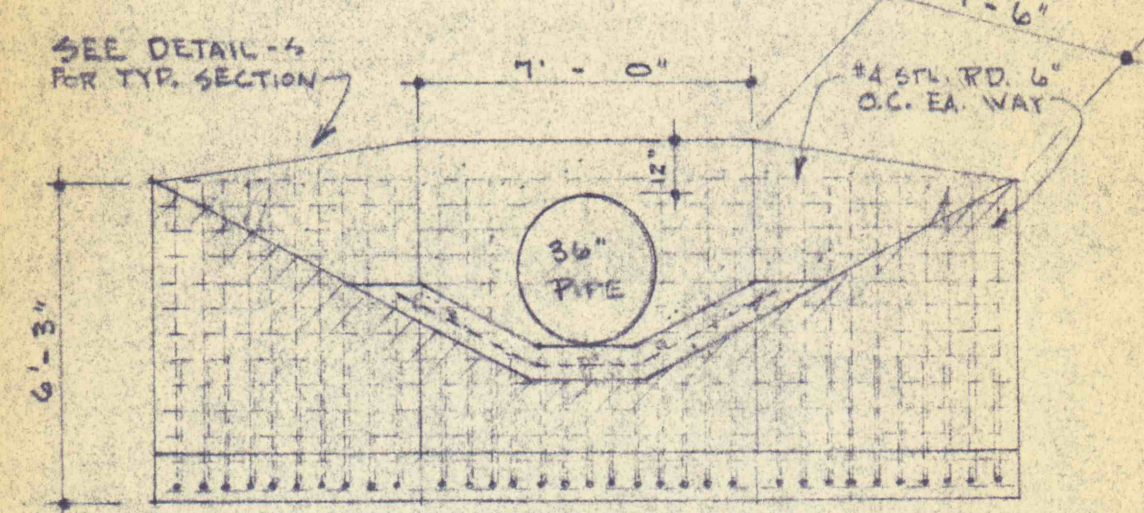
DETAIL OF CONNECTION DITCH "A" WITH DITCH "C" - (K)
